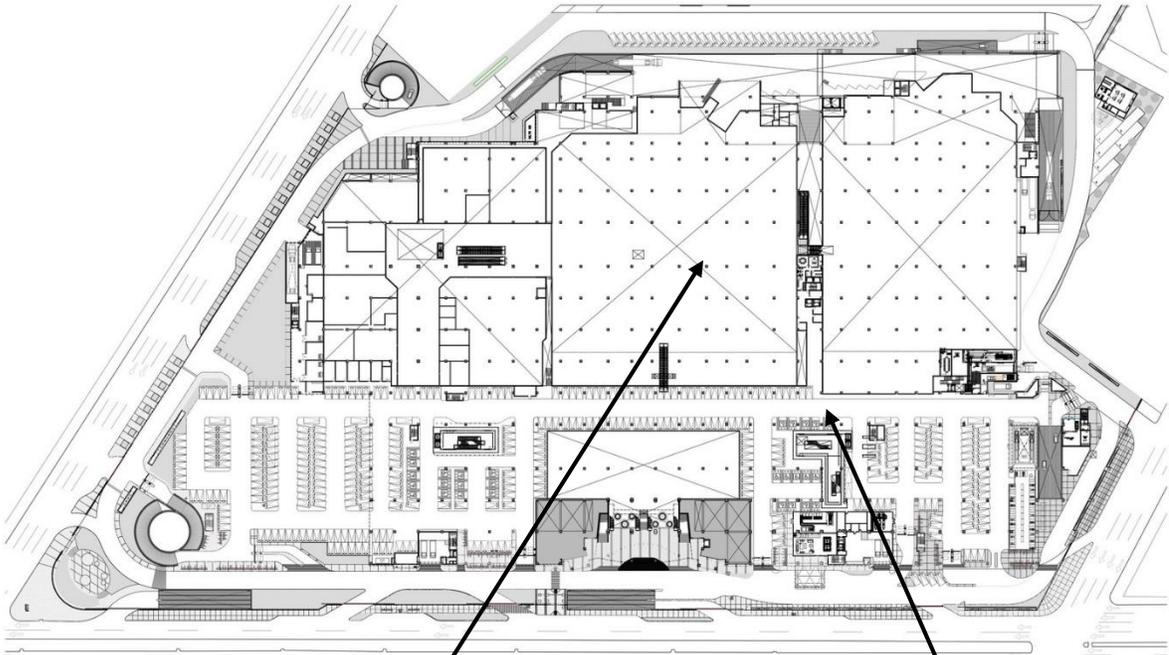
Overview Site Layout of Via Vallejo Cinepolis Building.
